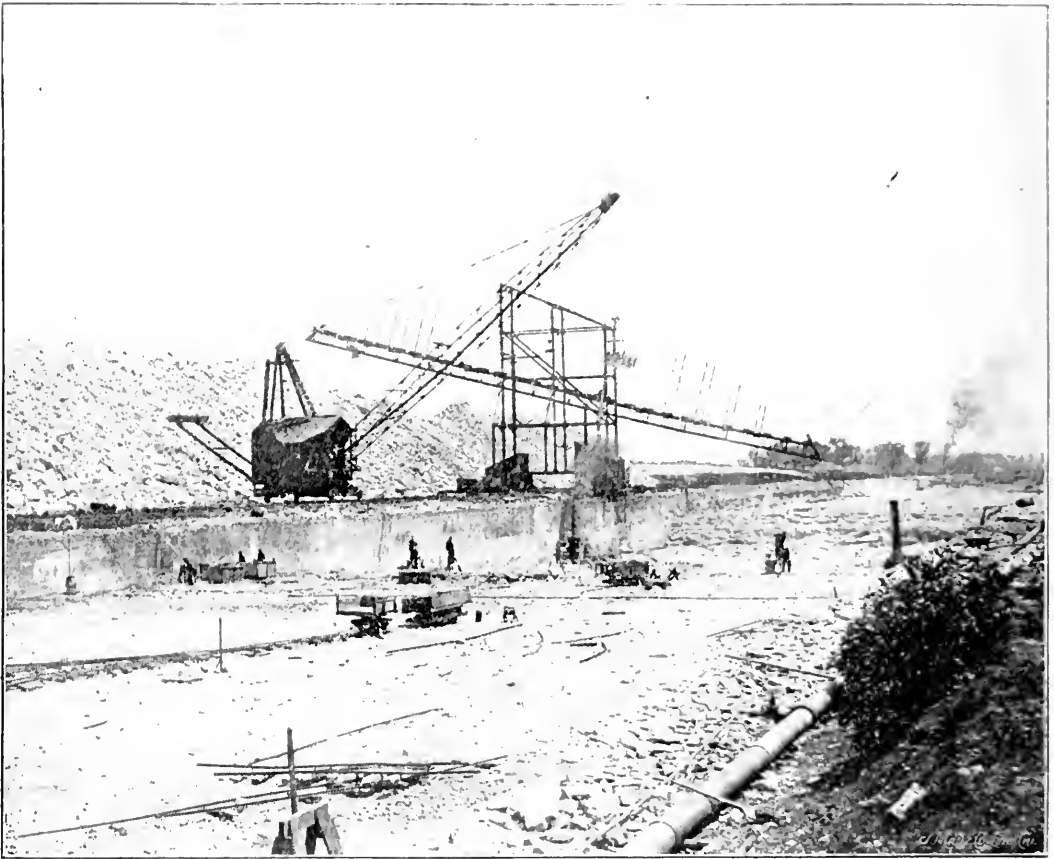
GENERAL ARRANGEMENT OF McMYLER DERRICK AND HULETT CANTILEVER USED ON SECTION 7.
